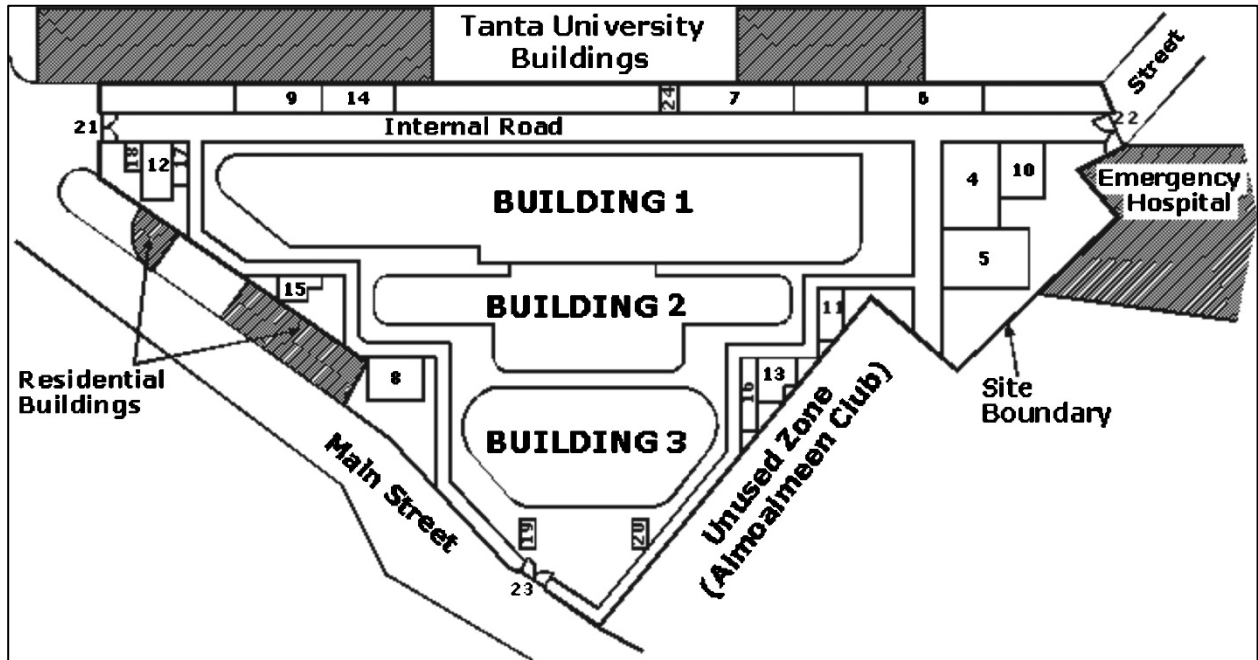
Location plan of a proposed buildings (Sanad, 2008)
